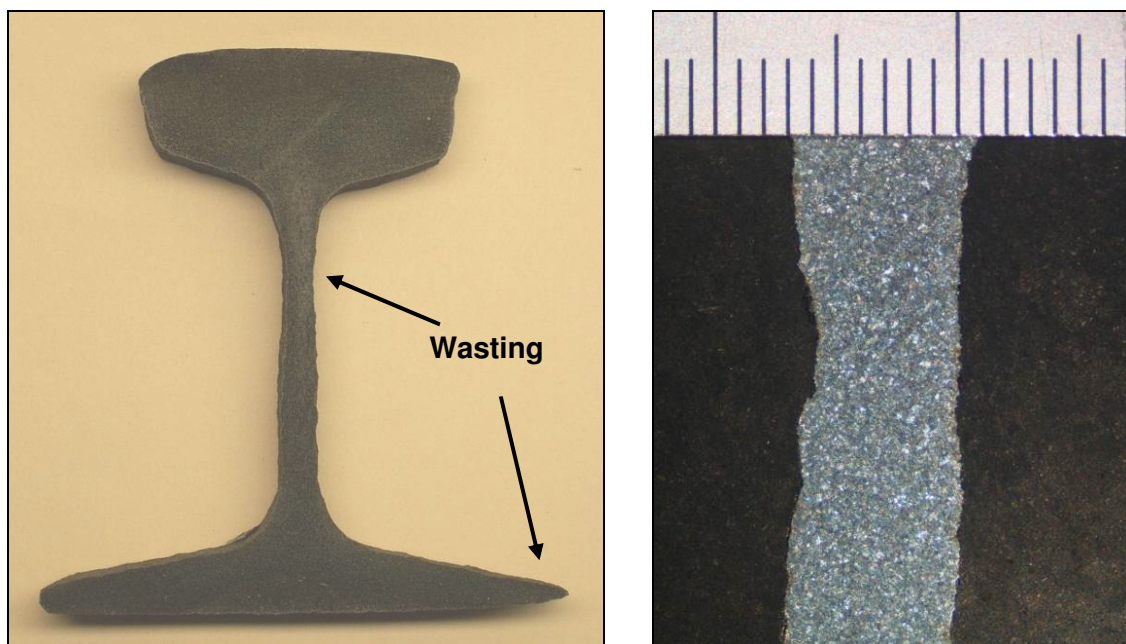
Rail cross section, indicating wasting of the foot and web (shown right with 1 mm scale)
